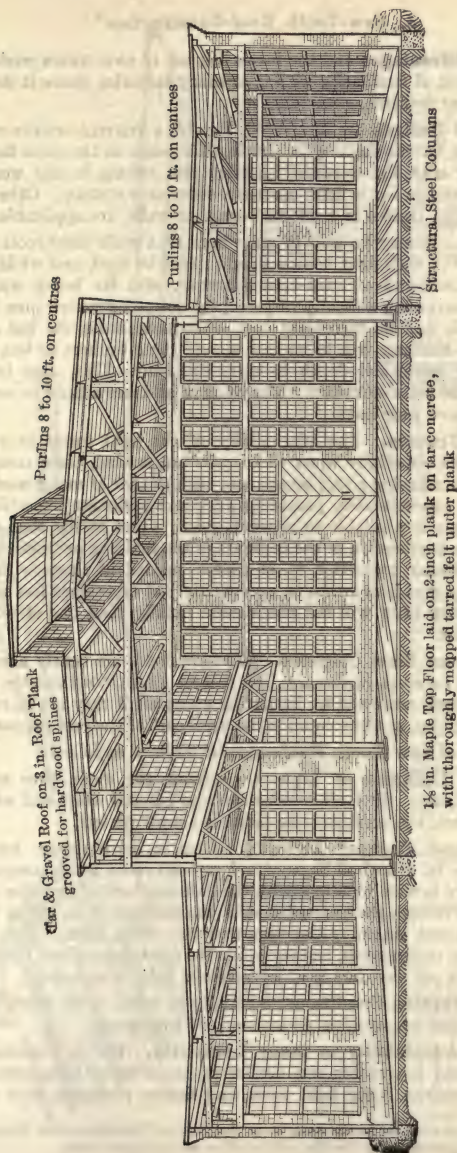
One-story Work-shop. Roof-boards on Purlins
